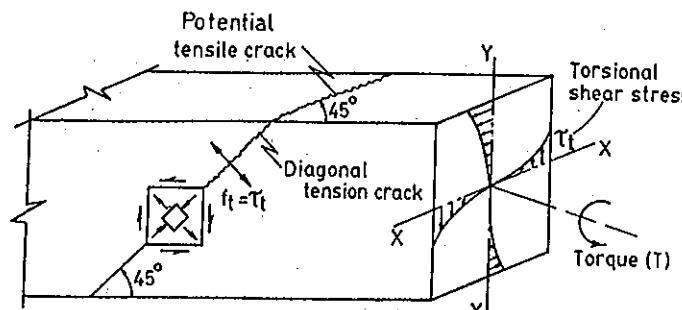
Torsional Shear Stresses and Cracks in a Beam of Rectangular Section
